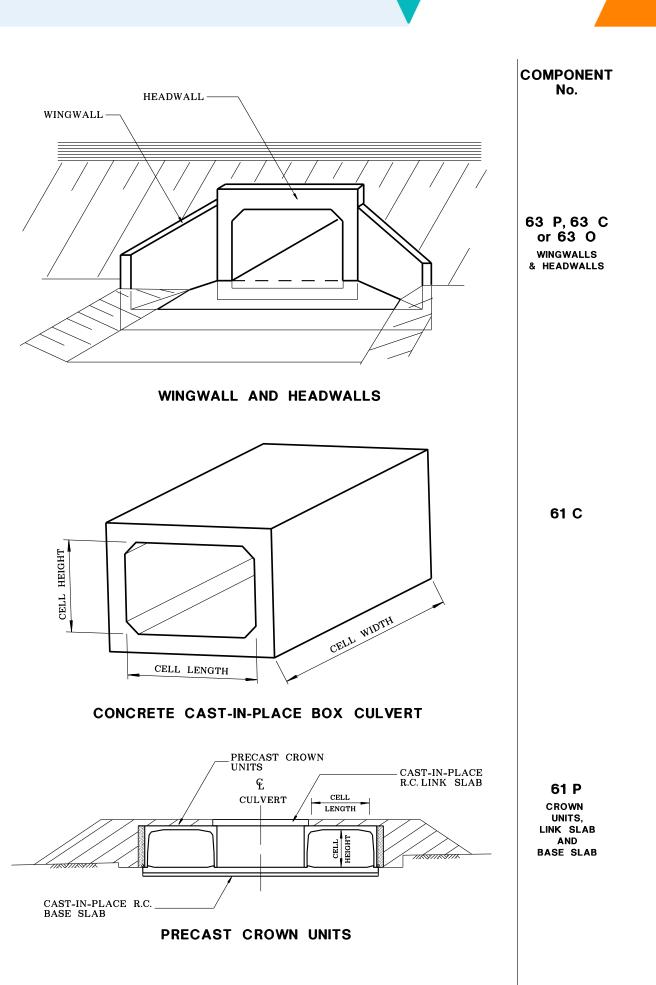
CULVERTS (Sheet 2 of 2)
